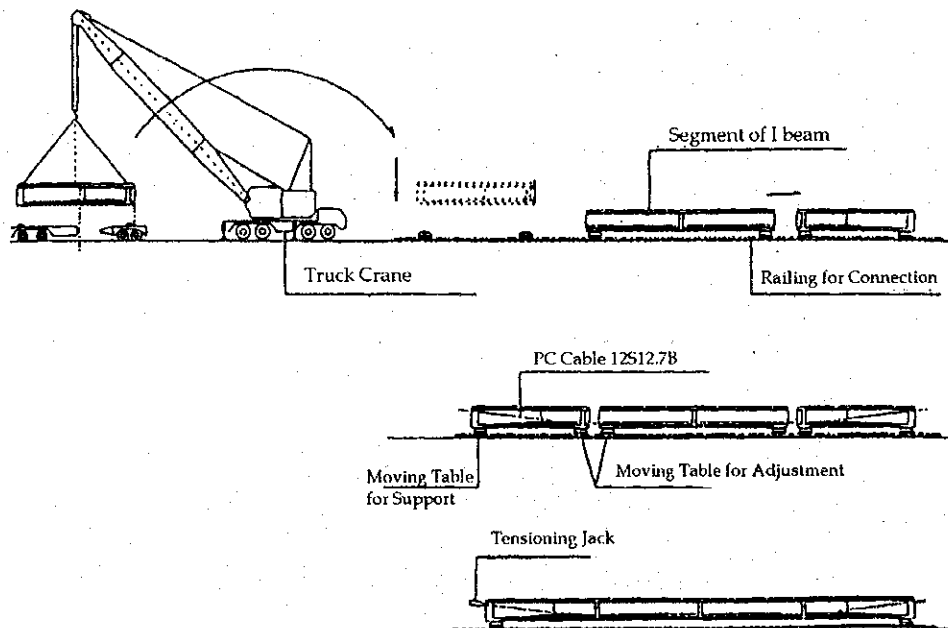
Connecting Work of Segment to 1 Span PC Composite I beam
